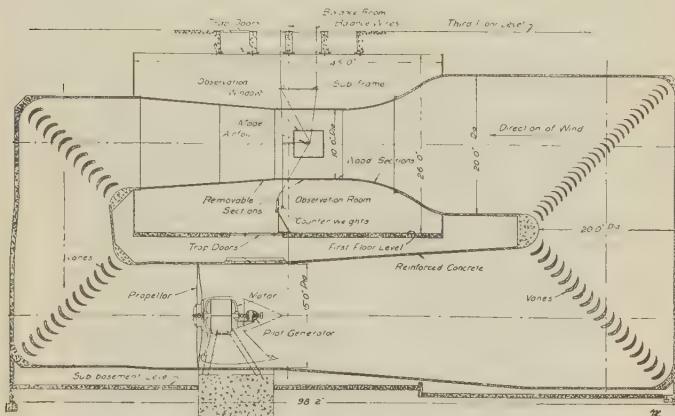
LONGITUDINAL SECTION OF THE WIND TUNNEL (VERTICAL PLANE)
